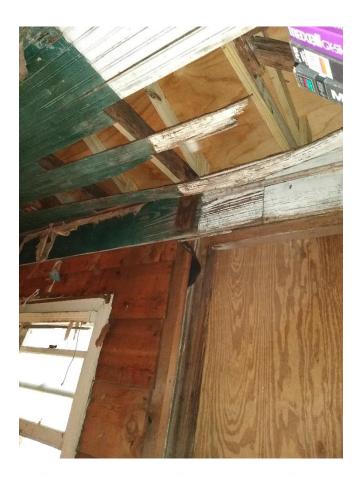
Interior of porch enclosure showing original exterior grade bead-board ceiling. Note the two ceiling paint colors. Originally, there was a wall that divided the bathroom from a screened enclosure between bathroom and side entrance to house.
